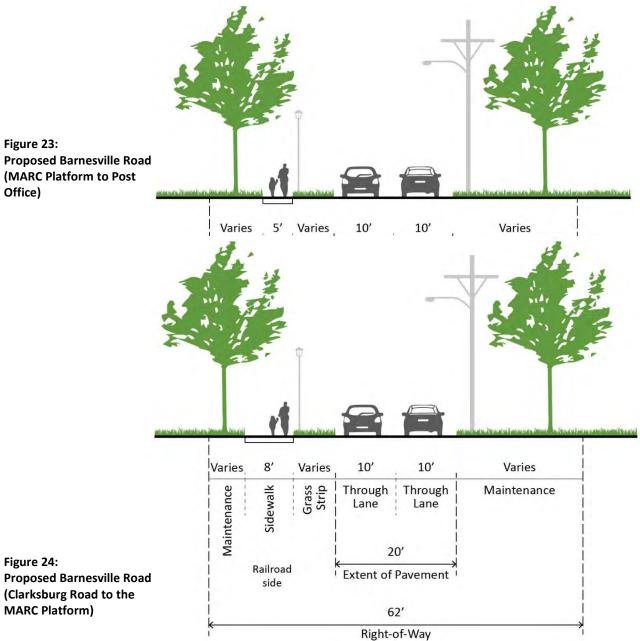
Proposed Barnesville Road (Clarksburg Road to the MARC Platform)
